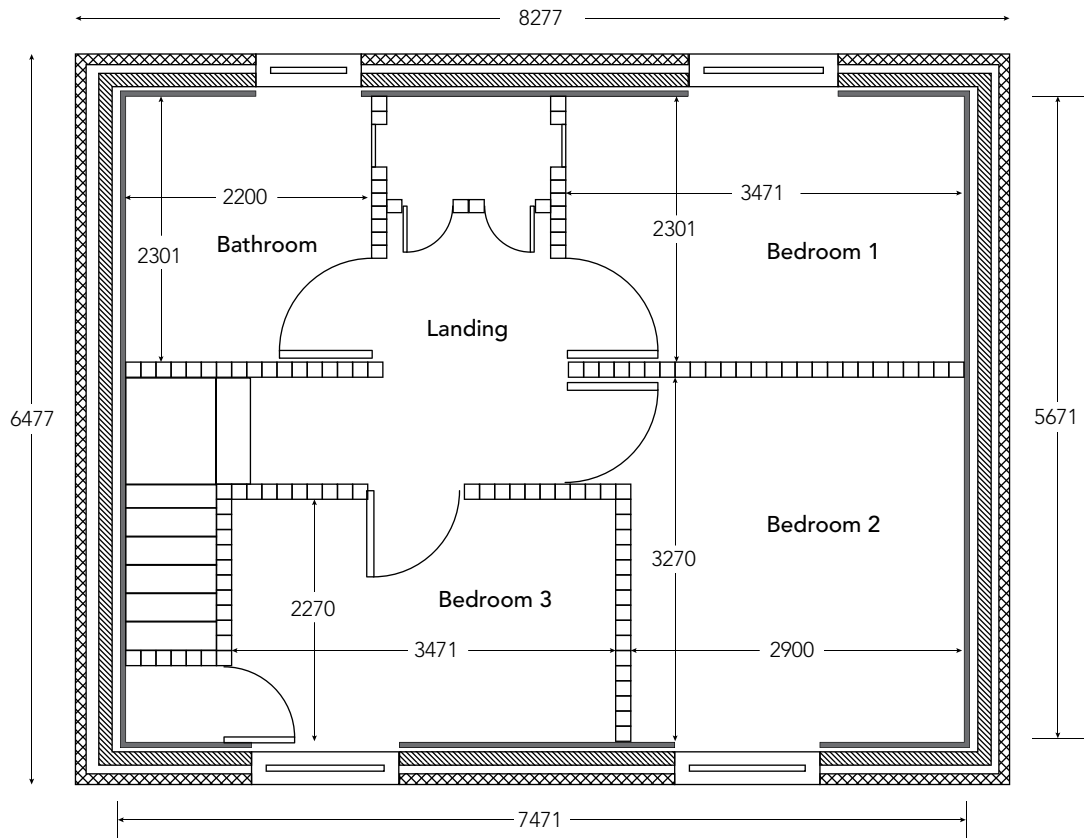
First floor plan for the BRE test houses (dimensions measured in millimetres)
